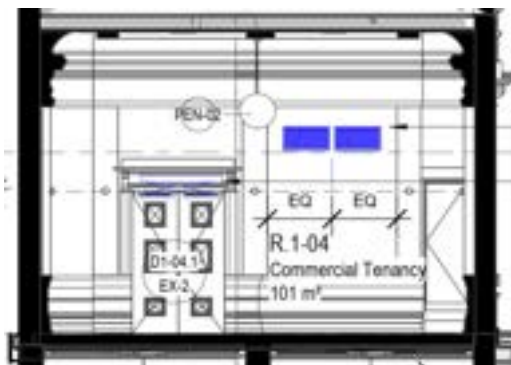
A3-250 Proposed section of the main hall R.1-04 showing the automatic opening mechanism added to the top of the original doors. Source: Trethowan Architecture, 2025.
